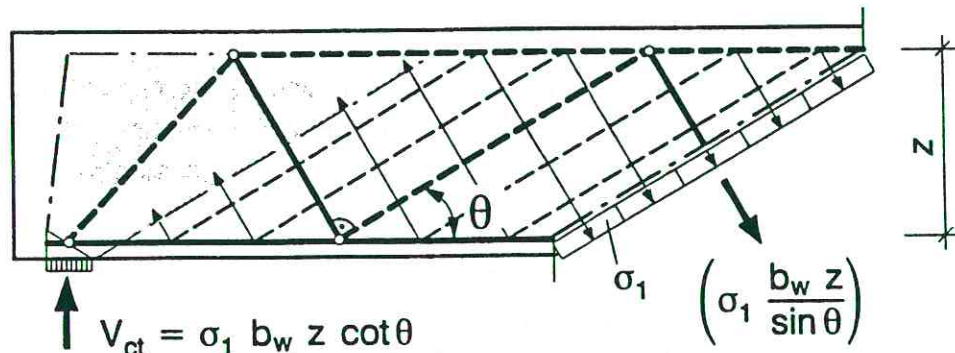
Model with concrete ties respectively with an inclined biaxial tension - compression field in the web for members with low and without transverse reinforcement
